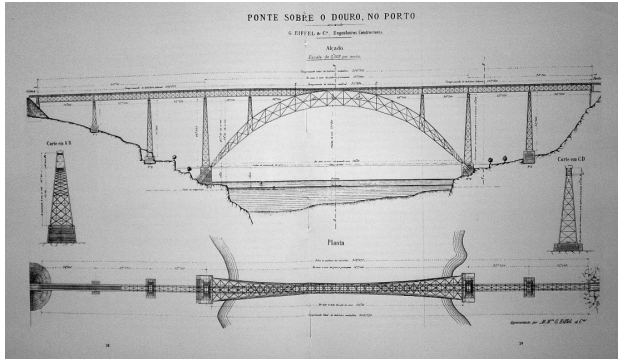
Plan and elevation of Maria Pia Bridge [12] Eiffel
